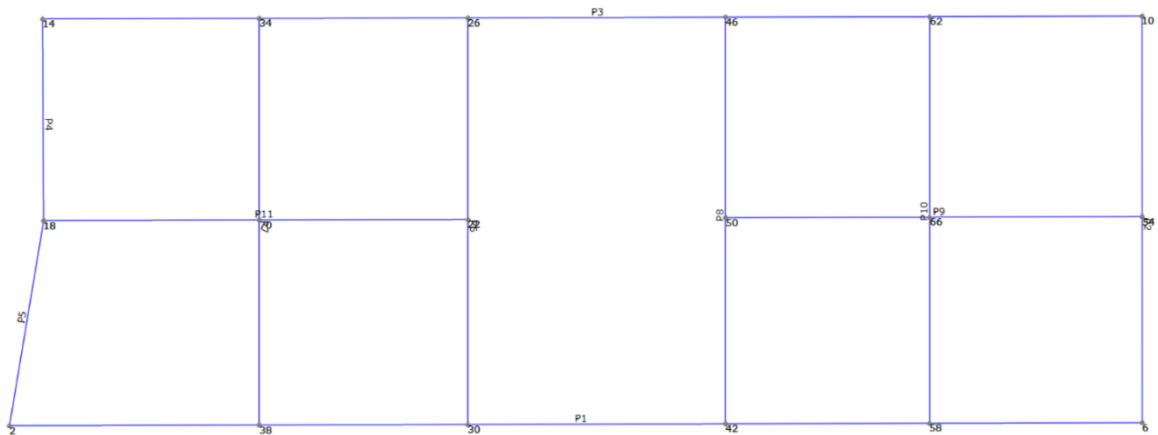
Names of the walls of the building in the model in 3Muri (plan of the ground floor).
